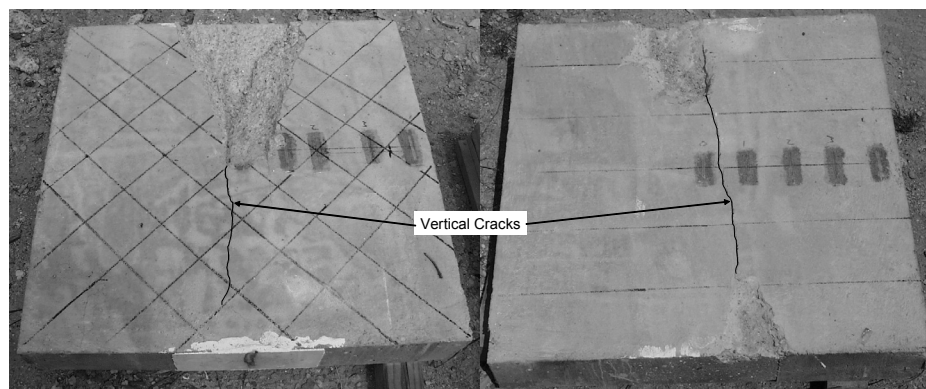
Additional photographs of specimens after failure (left: Specimen H; right: Specimen L)
